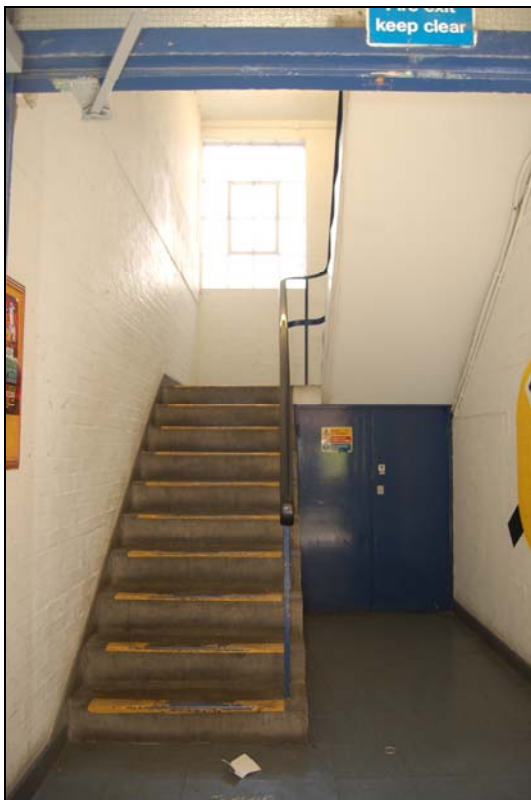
Building B, ground floor, stairs from main access (FCQ14-0097)
